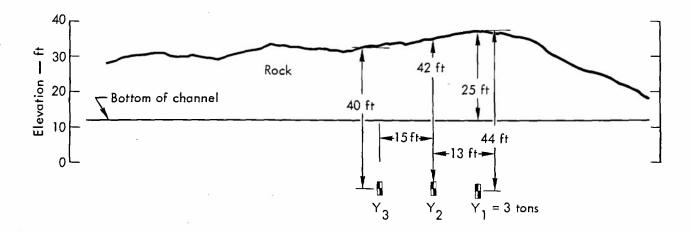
Example of cut with constant bottom elevation and constant charge weights.
